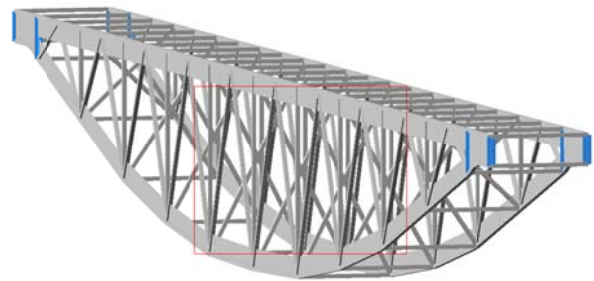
Spatial truss' model. Consists of two bonded plane models
